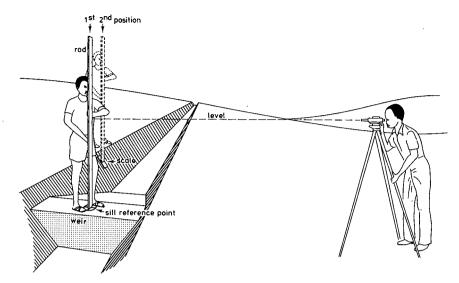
Stages of setting a gage on a lined canal side slope.
